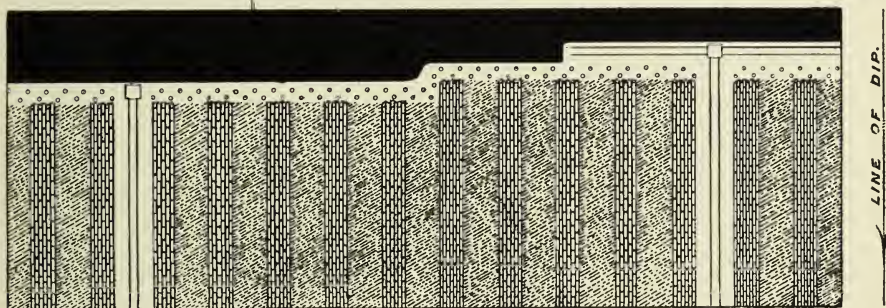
HIGH PARK COLLIERY, LANGLEY MILLS, NOTTS. PLAN SHOWING PART OF TWO STALLS WITH THE PACKWALLS, IN THE TOP HARD COAL SEAM.
